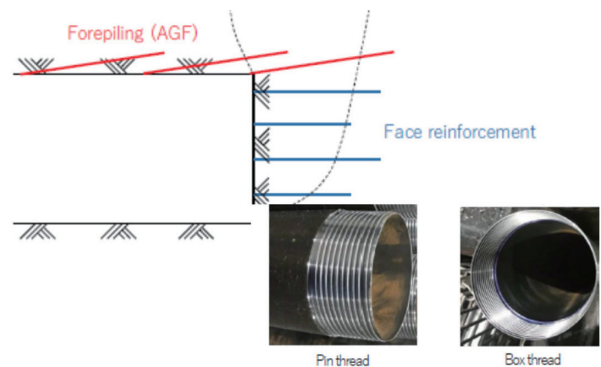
Schematic drawings of face reinforcement method and thread connection
